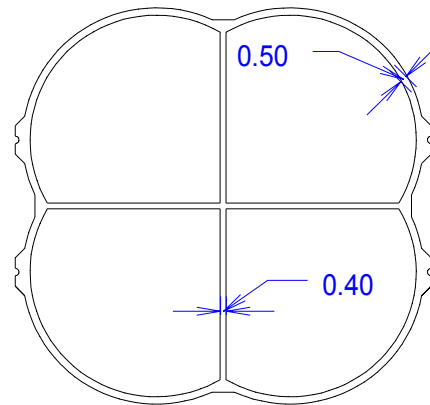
Horizontal section of caisson / Section horizontale du caisson
